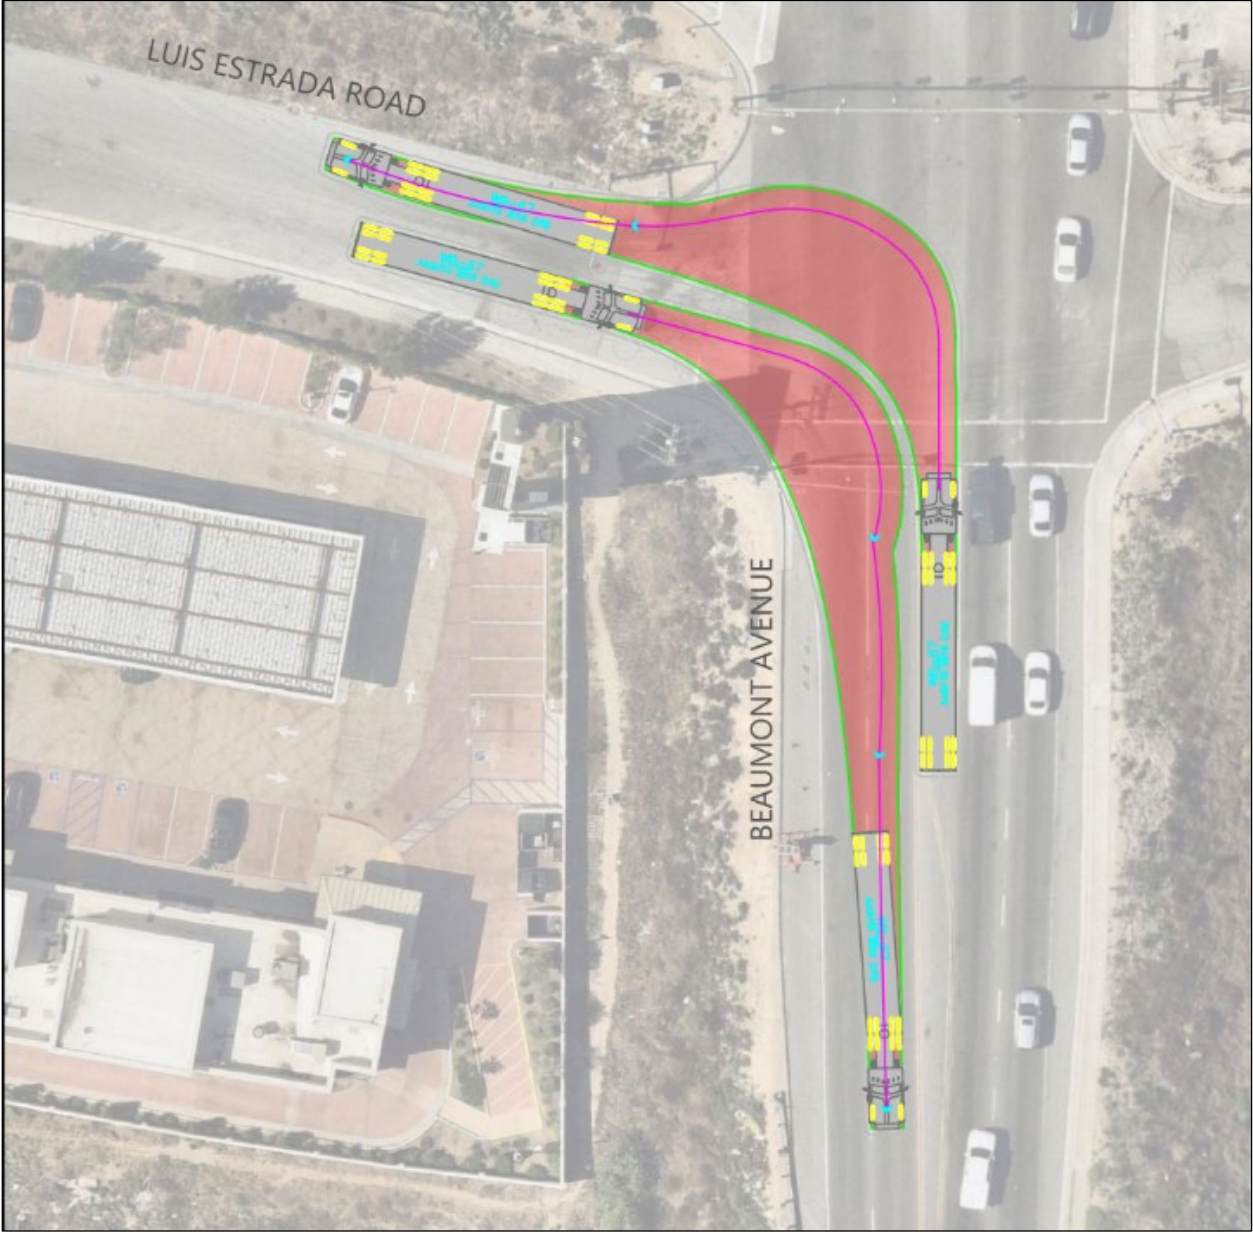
WB-67 Truck Turning Movements – Luis Estrada Road to/from Beaumont Avenue north
